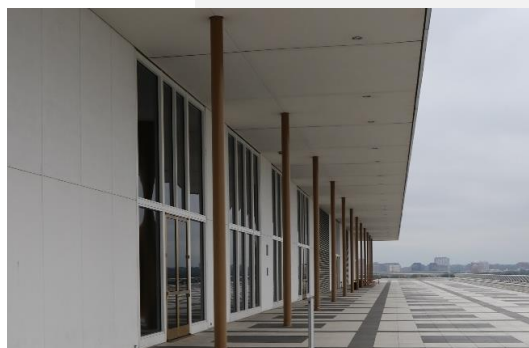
Terrace Level stucco walls and soffit (west facade shown).
